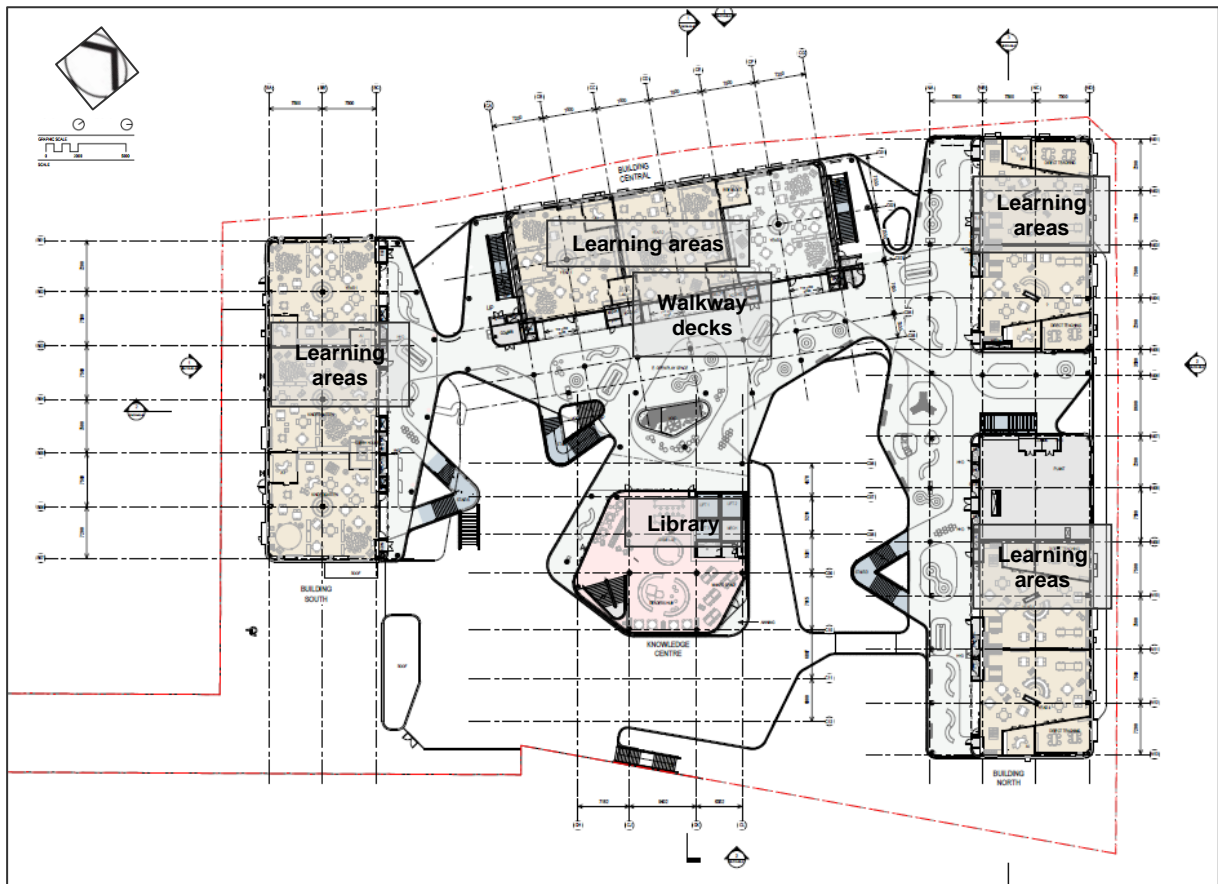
| Typical layout of proposed Level 2 / 3(layouts have marginal variation) (Source: Applicant's SRtS)
